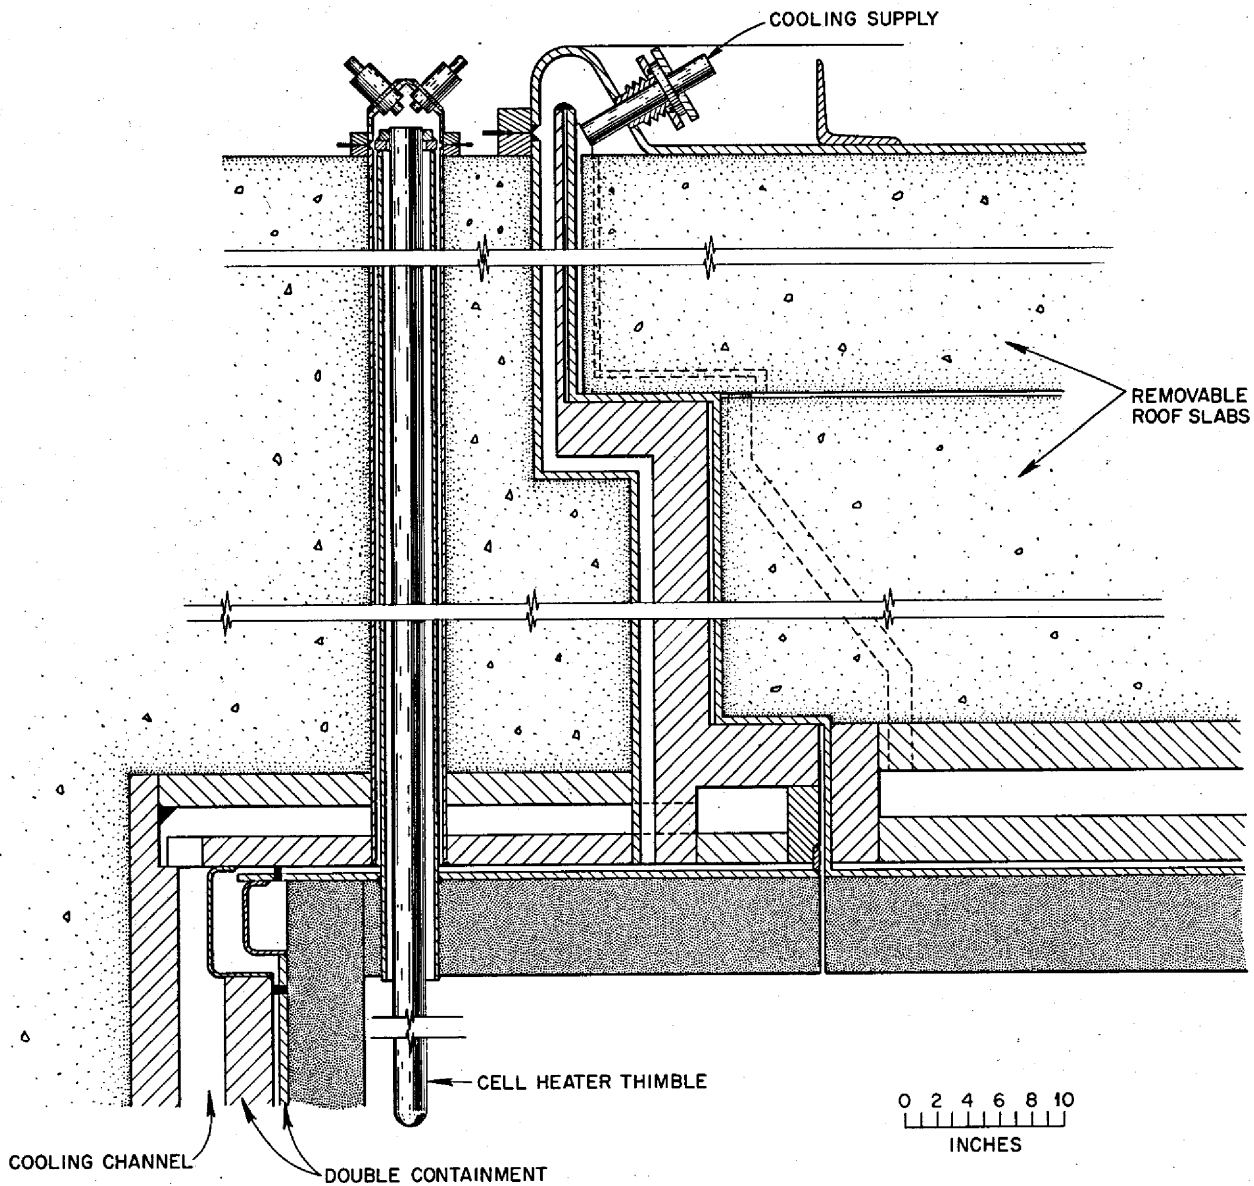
Cell Wall Construction at Roof Plugs.
